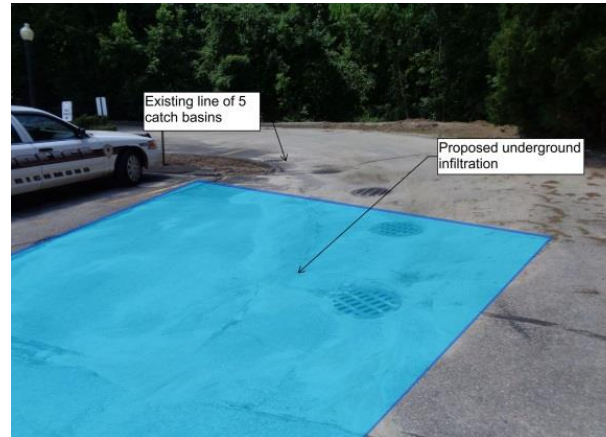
View of proposed underground infiltration area and existing catch basins adjacent to Main Street and the front of the police station.
